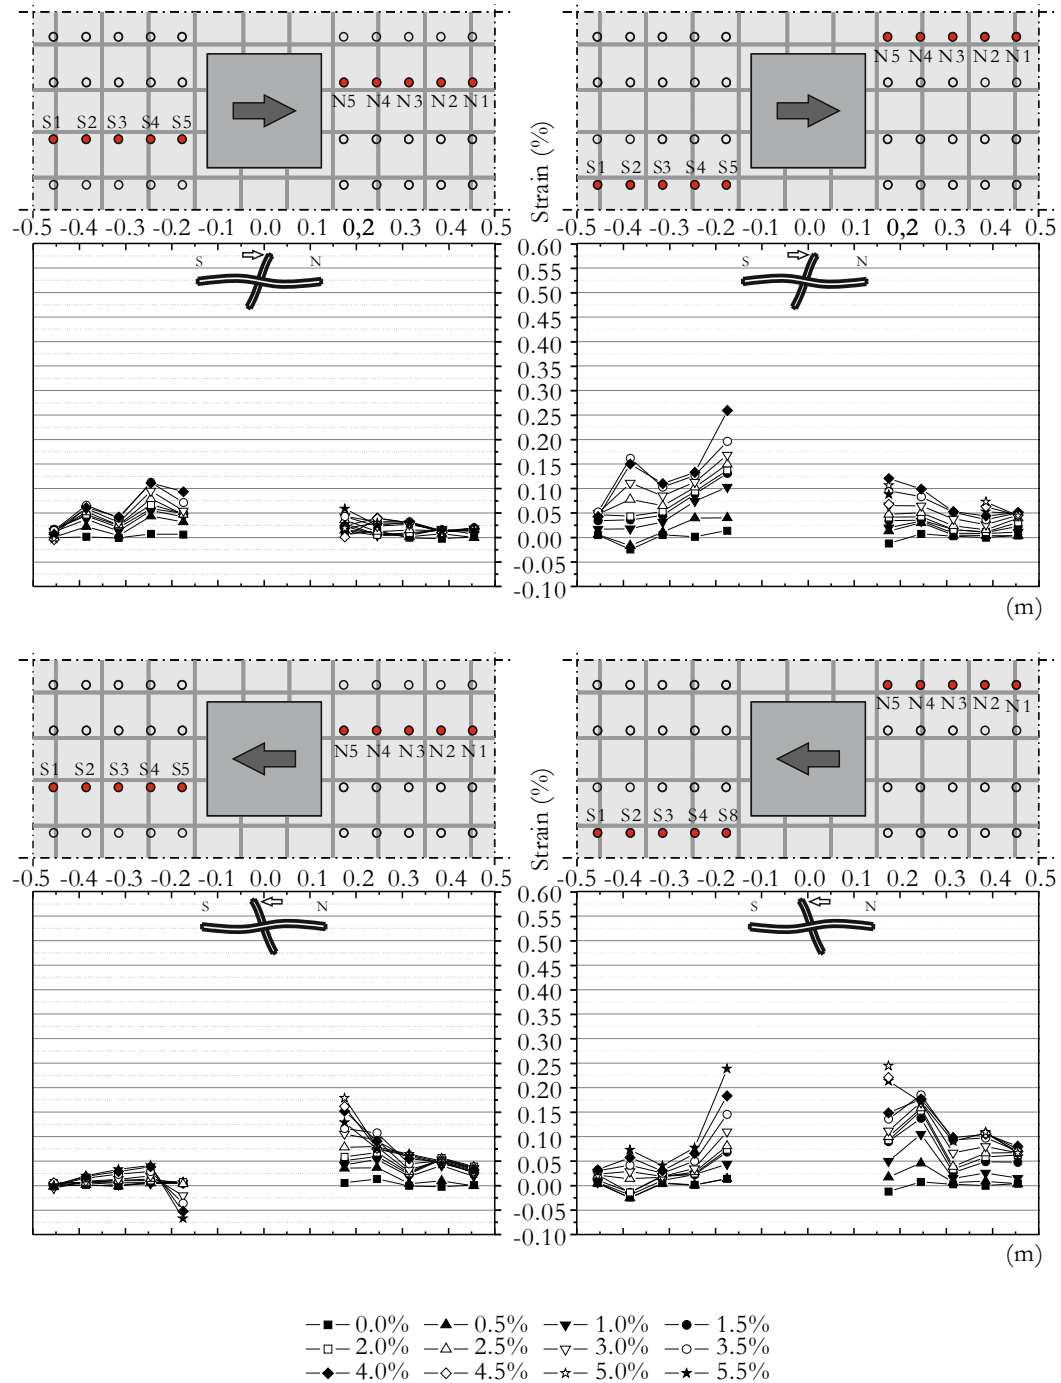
Strains in the shear reinforcement stirrups of the C-50 STR4 specimen.
